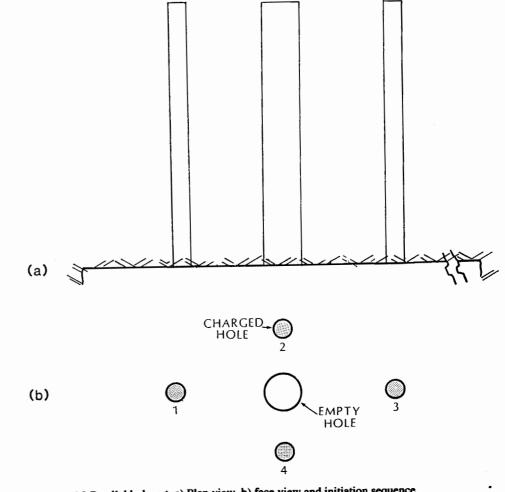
Parallel hole cut. a) Plan view, b) face view and initiation sequence.
